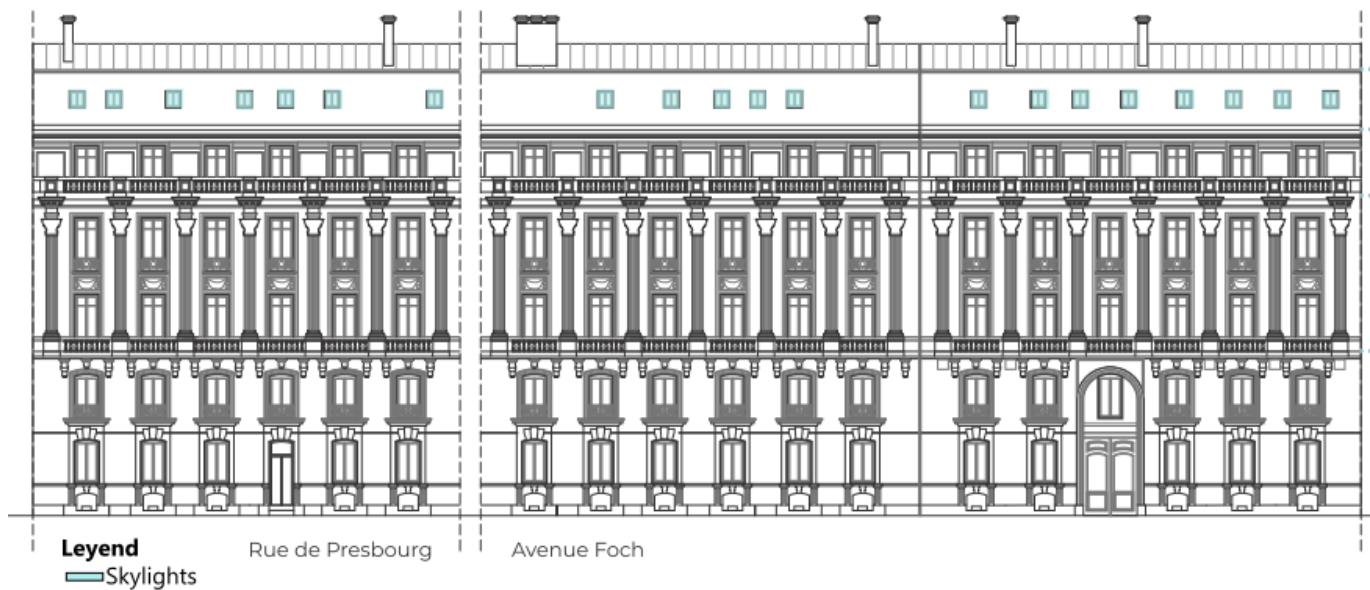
VERTICAL SURFACE DIVISION BEFORE RENOVATION (SOURCE: PAYET)
